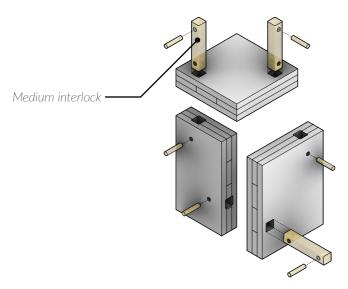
62. Exploded isometric view of joint type C (medium interlock)
